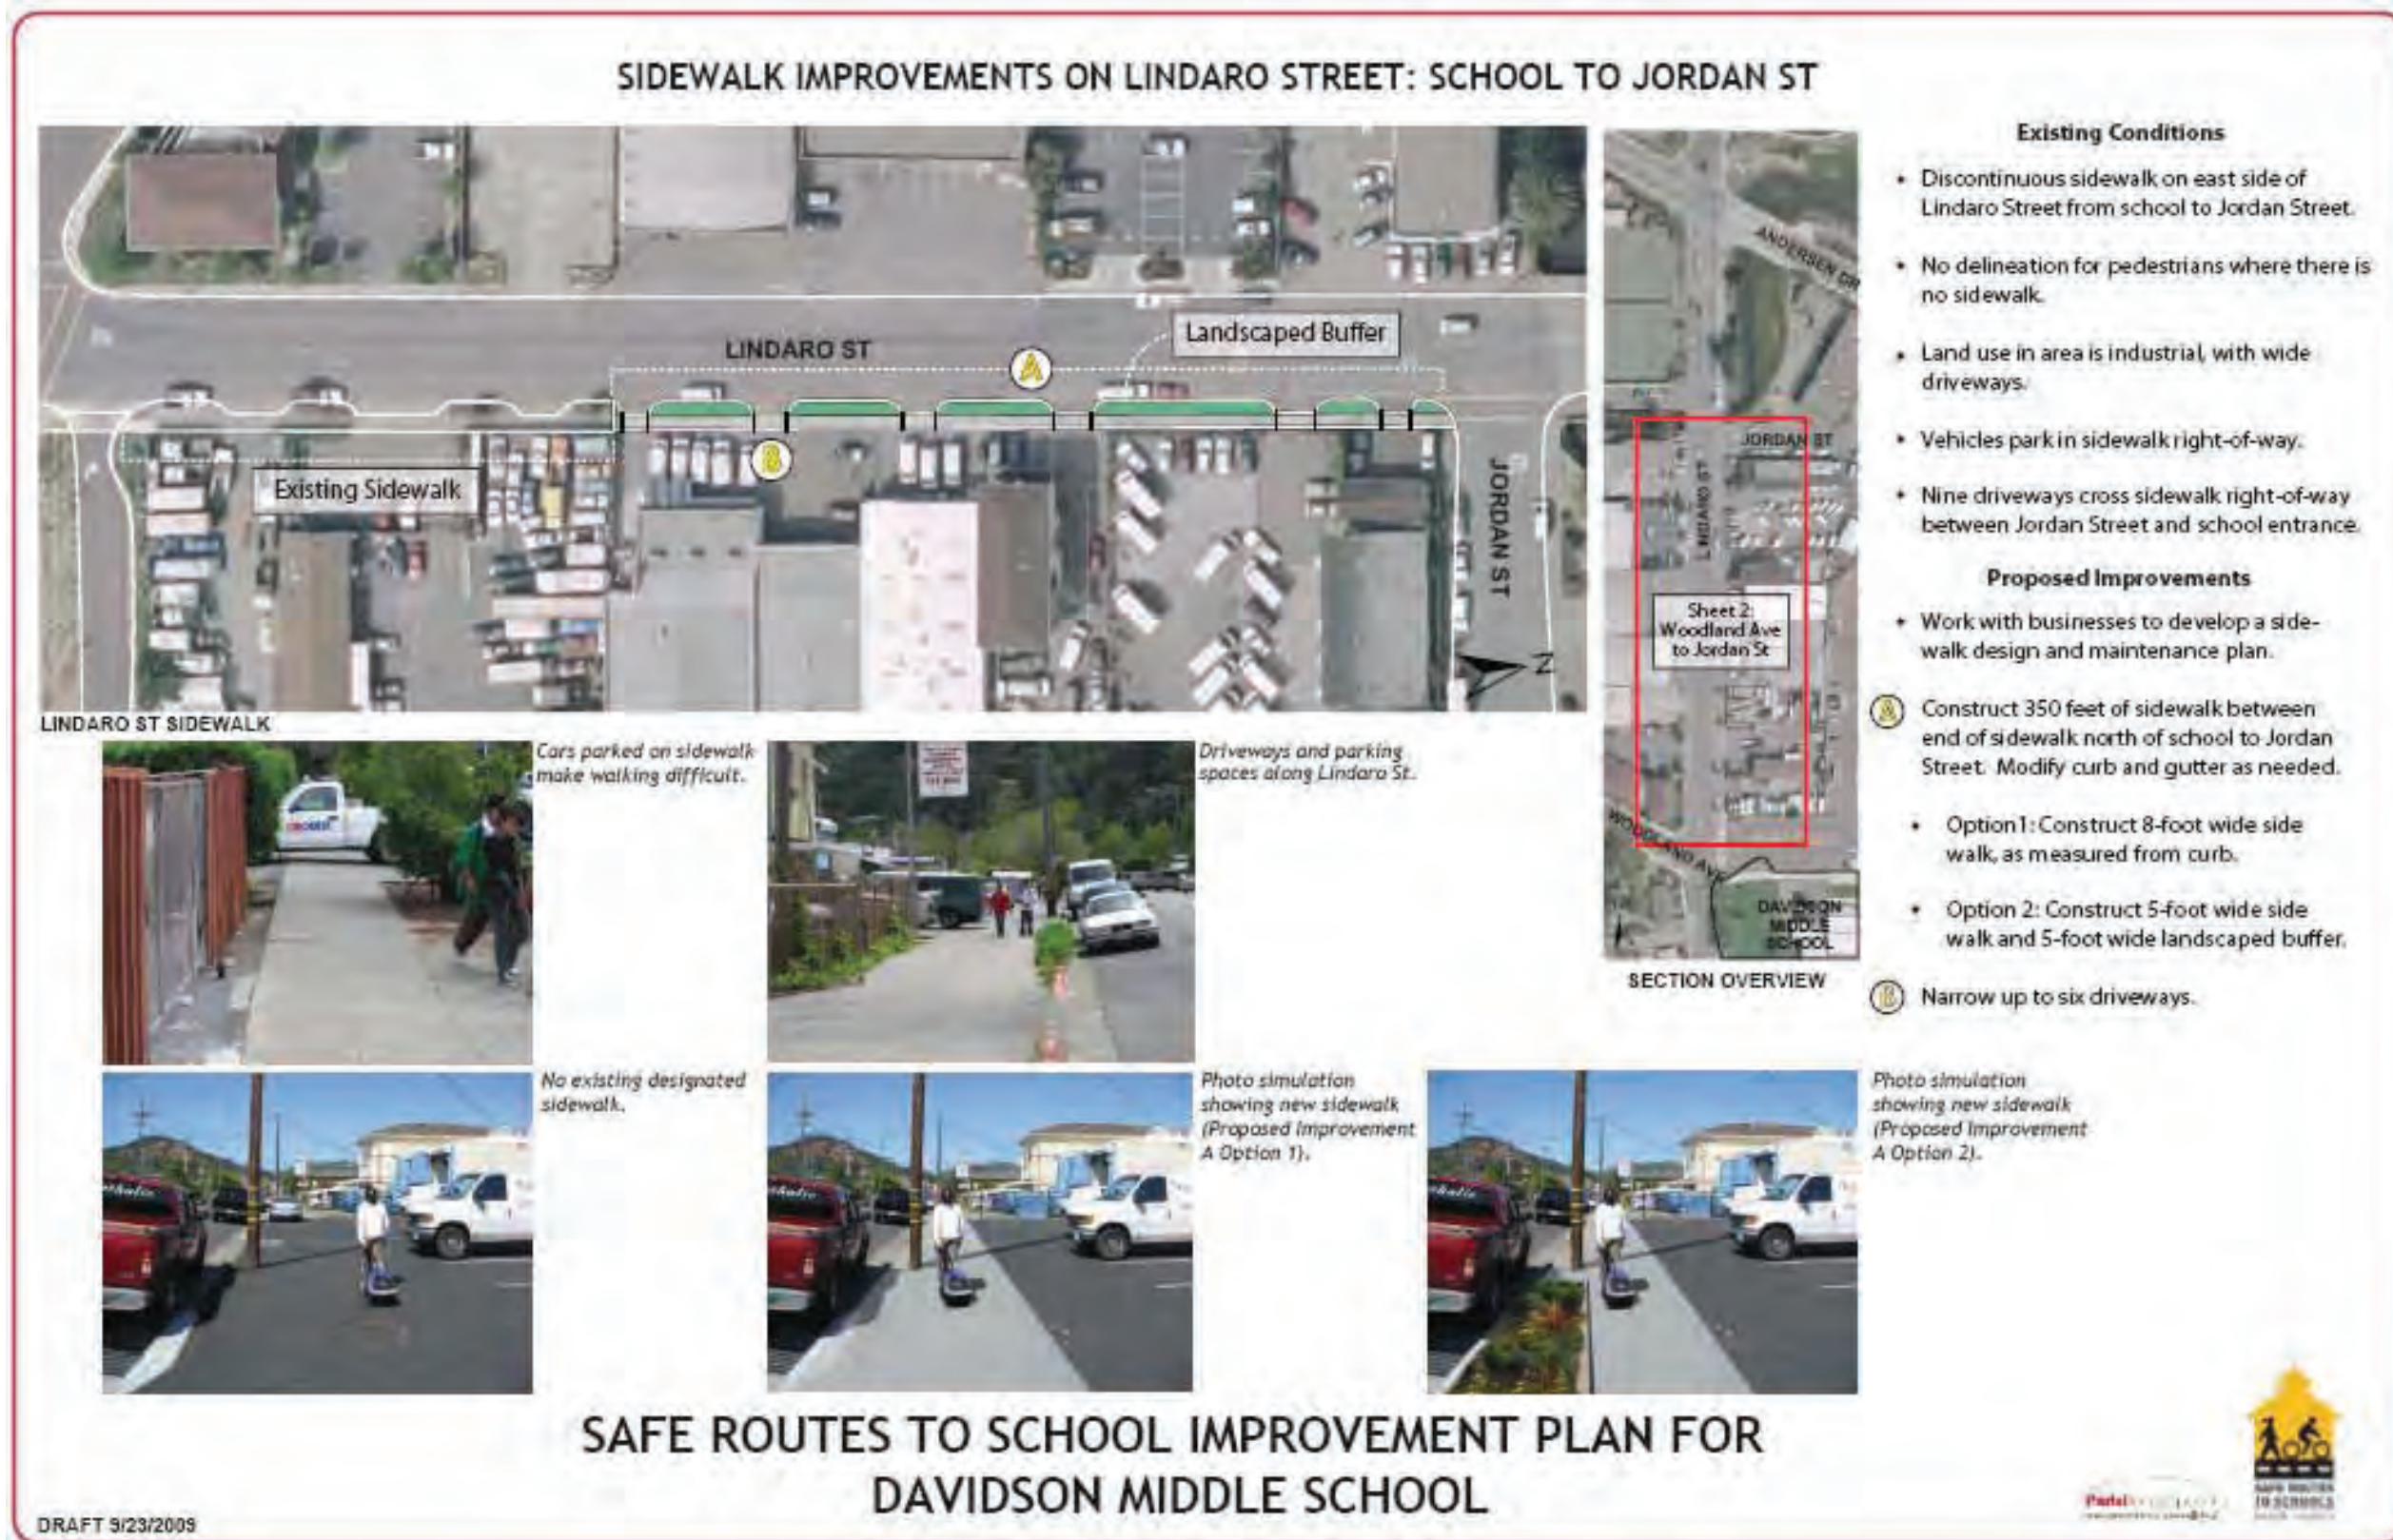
Sidewalk Improvements on Lindaro Street: School to Jordan Street
